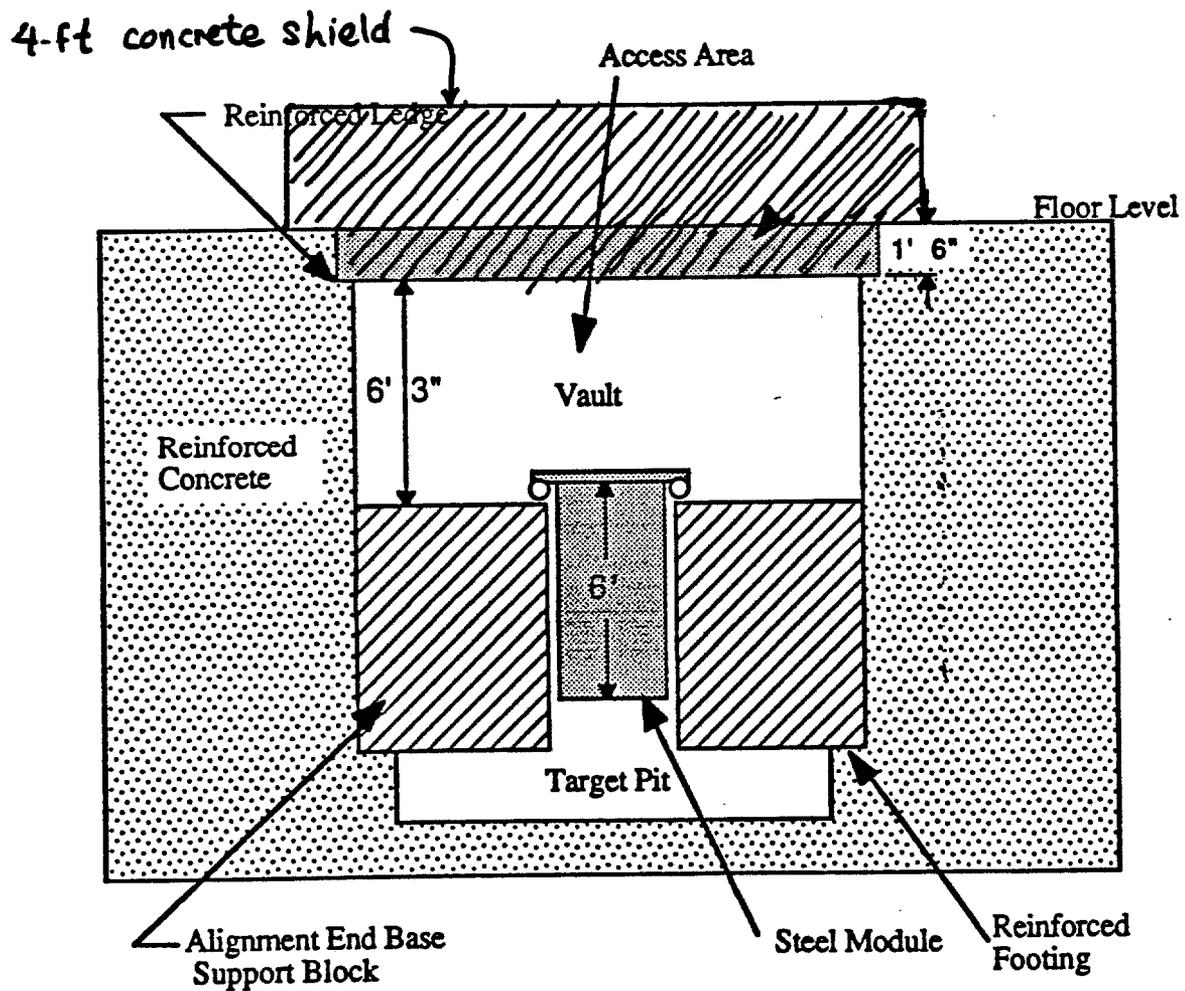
Elevation schematic of vault showing proposed 4-ft. concrete shield.
